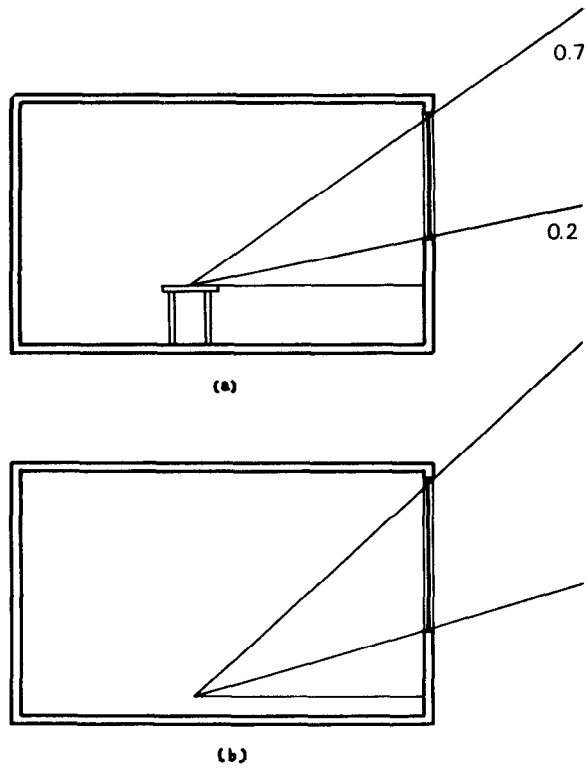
ILLUSTRATION DEPICTING USE OF PROTRACTORS ON (a) SECTIONAL ELEVATION AND (b) PLAN OF A ROOM FOR A WINDOW WITHOUT LOUVRES (EXAMPLE 14)
